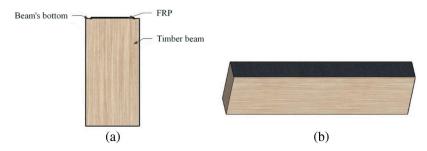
Schematic Diagram of FRP sheet reinforcement of timber beam (a is the sectional view, b is the longitudinal view)
